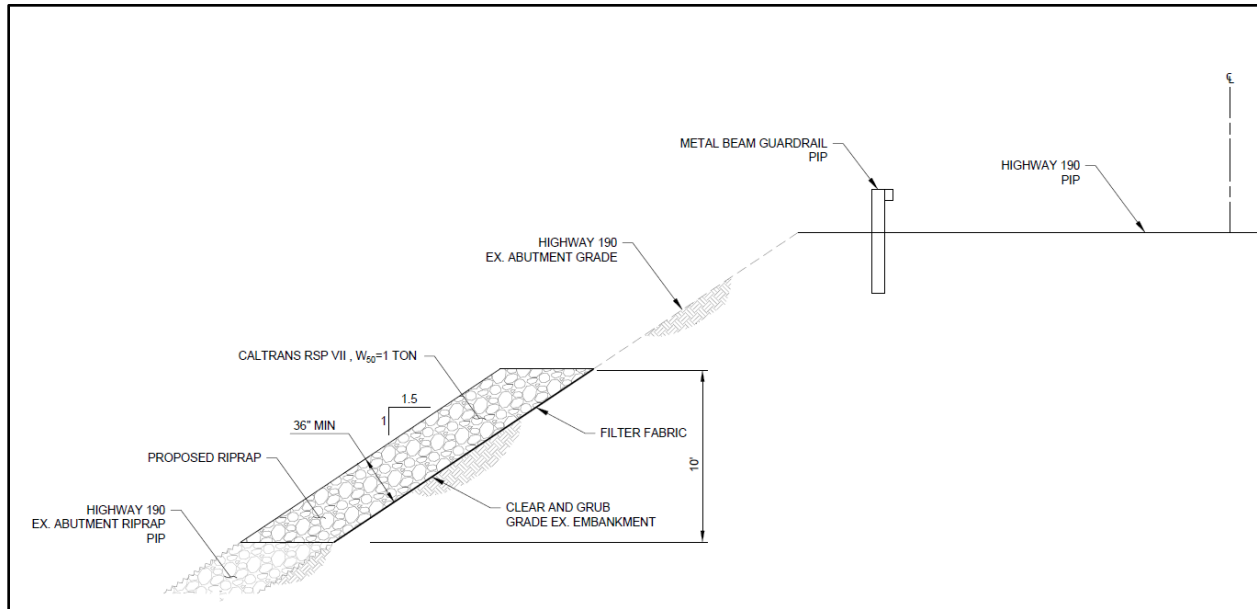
Typical cross-section for rock revetment (riprap) placement along the Highway 190 bridge abutments.
